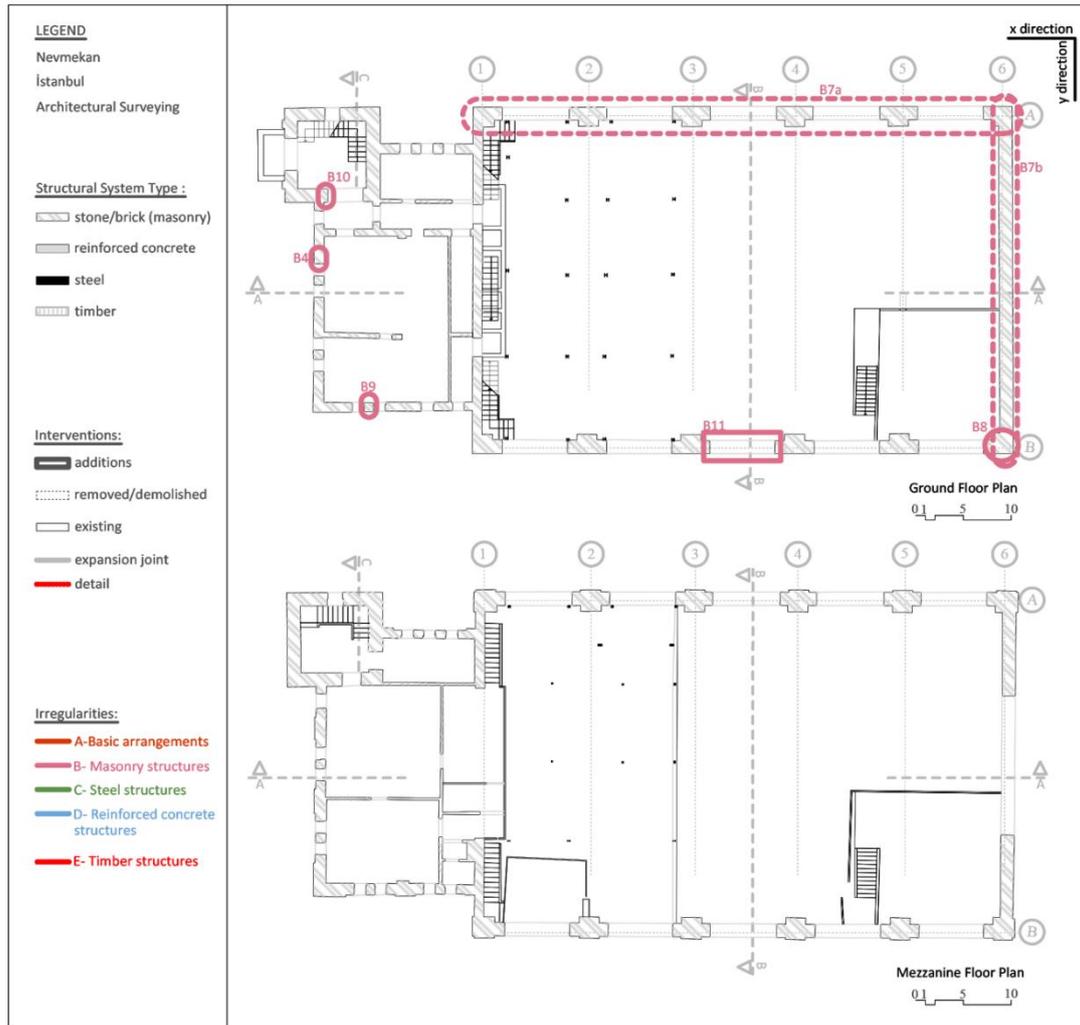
Üsküdar Electricity Factory architectural surveying floor plans (Adapted from Koroğlu, 2019)
